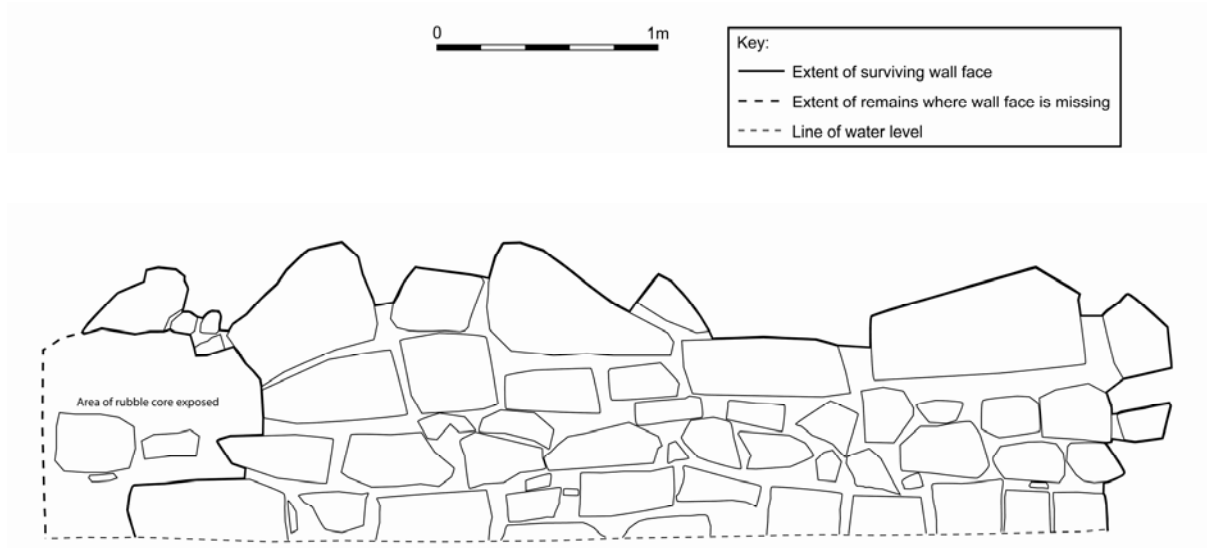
Structure 4, Rusticated Bridge #2 (Lower Bridge): Elevation e
